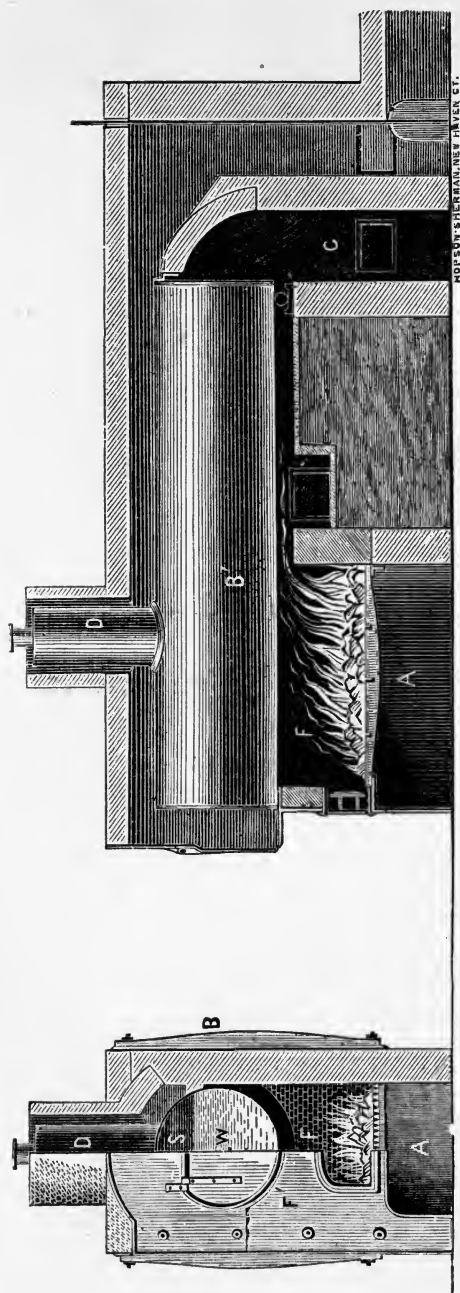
PLATE II.—Plain Cylinder Boiler set in Brick-work.
